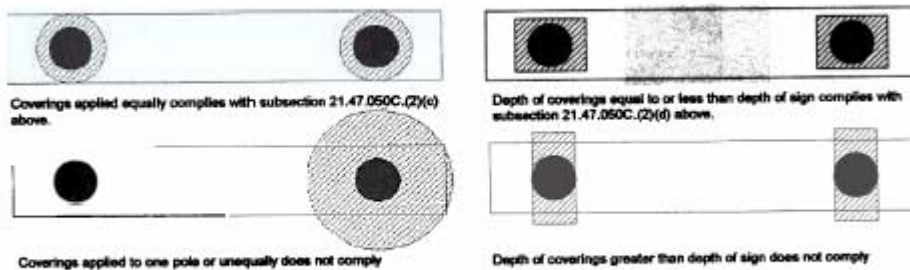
Examples of pole wrap. Poles depicted in plan view.
